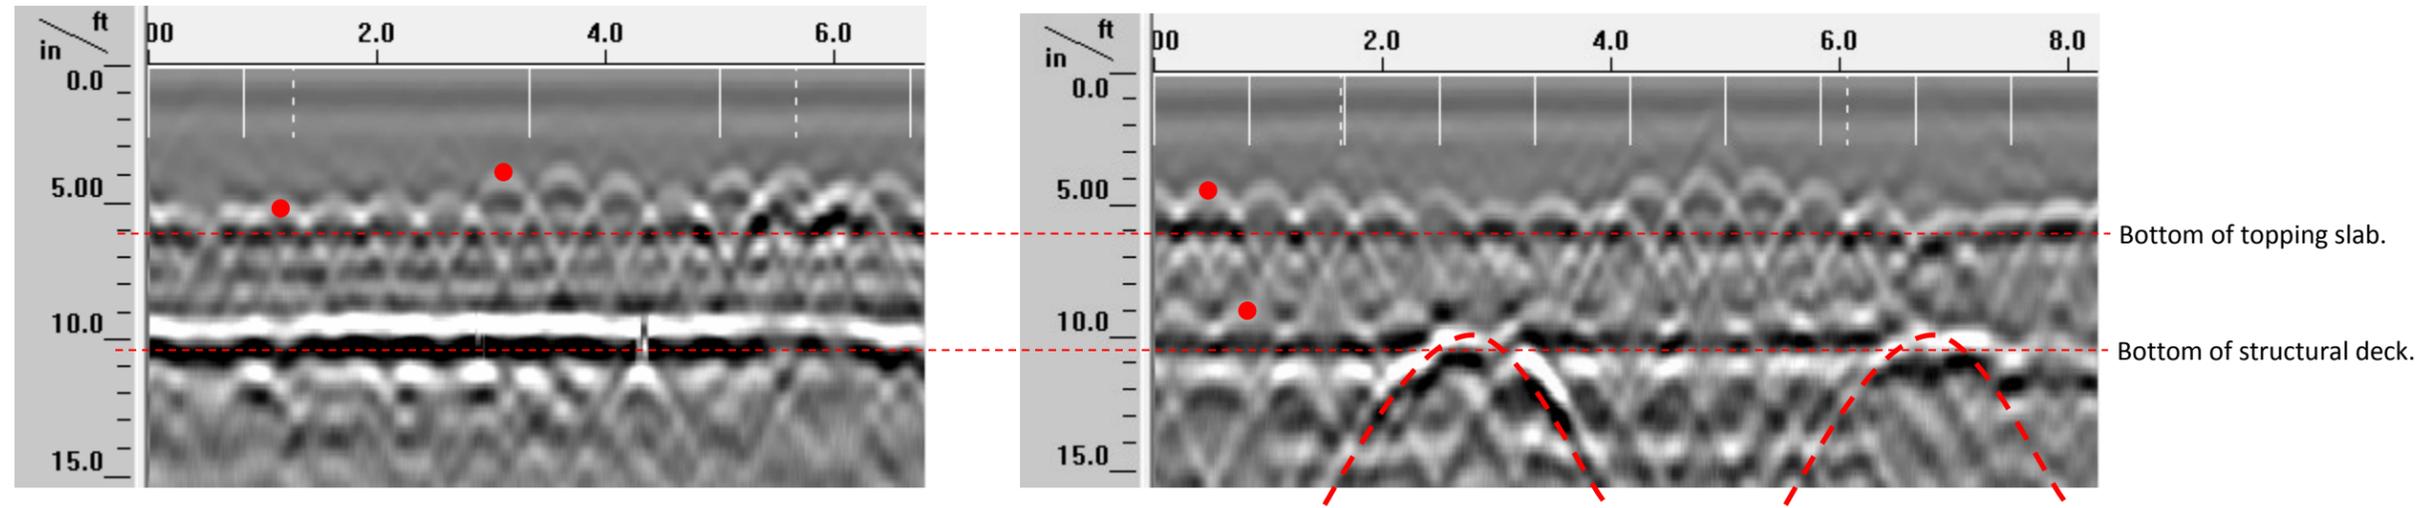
GPR profile F002.dzt along the front of the Wells Fargo Bank Building parallel to Main Street. Shown in the profile are the transverse reinforcing in the upper and lower mats (arches). The bottom of the topping slab (yellow arrow at roughly 6 inches) and the structural deck (blue arrows at roughly 10.5 inches) are shown. The steel beams supporting the structural deck are shown (red dashed arch). The basement space appears to terminate roughly 8 feet before the edge of the building (red vertical line and red arrow).
